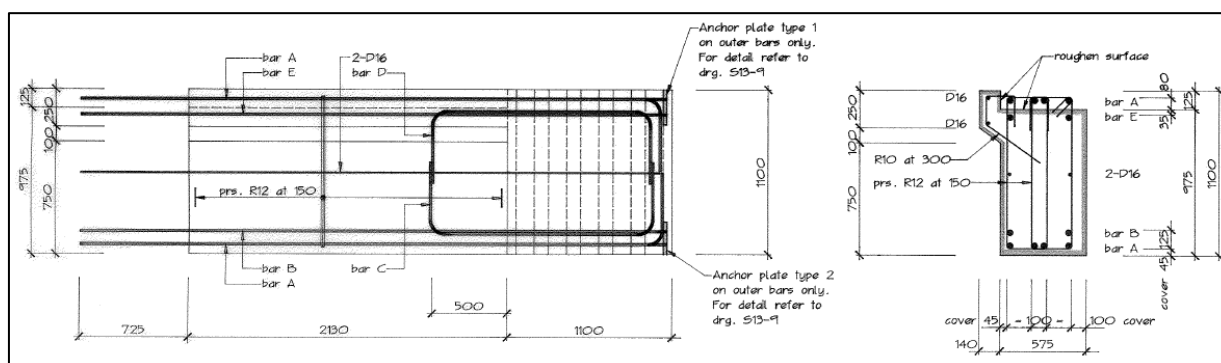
Typical section and elevation view of beams tested (Holmes, 1988).
